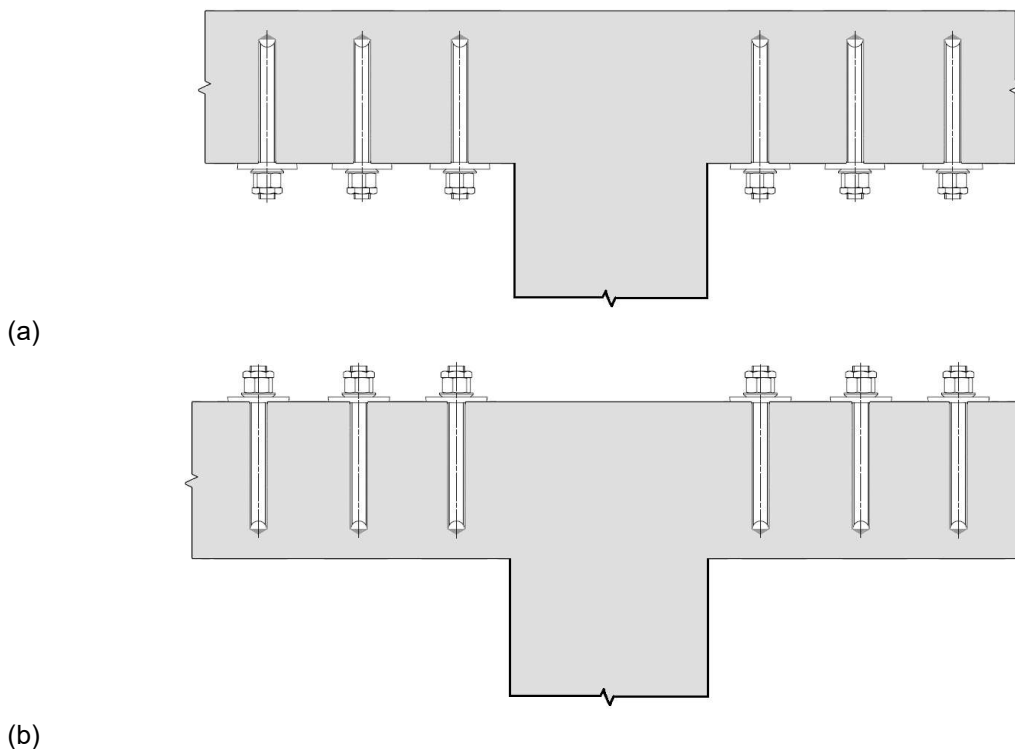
Schematic representation of the installed system. (a) Installation from bottom; (b) Installation from top.
